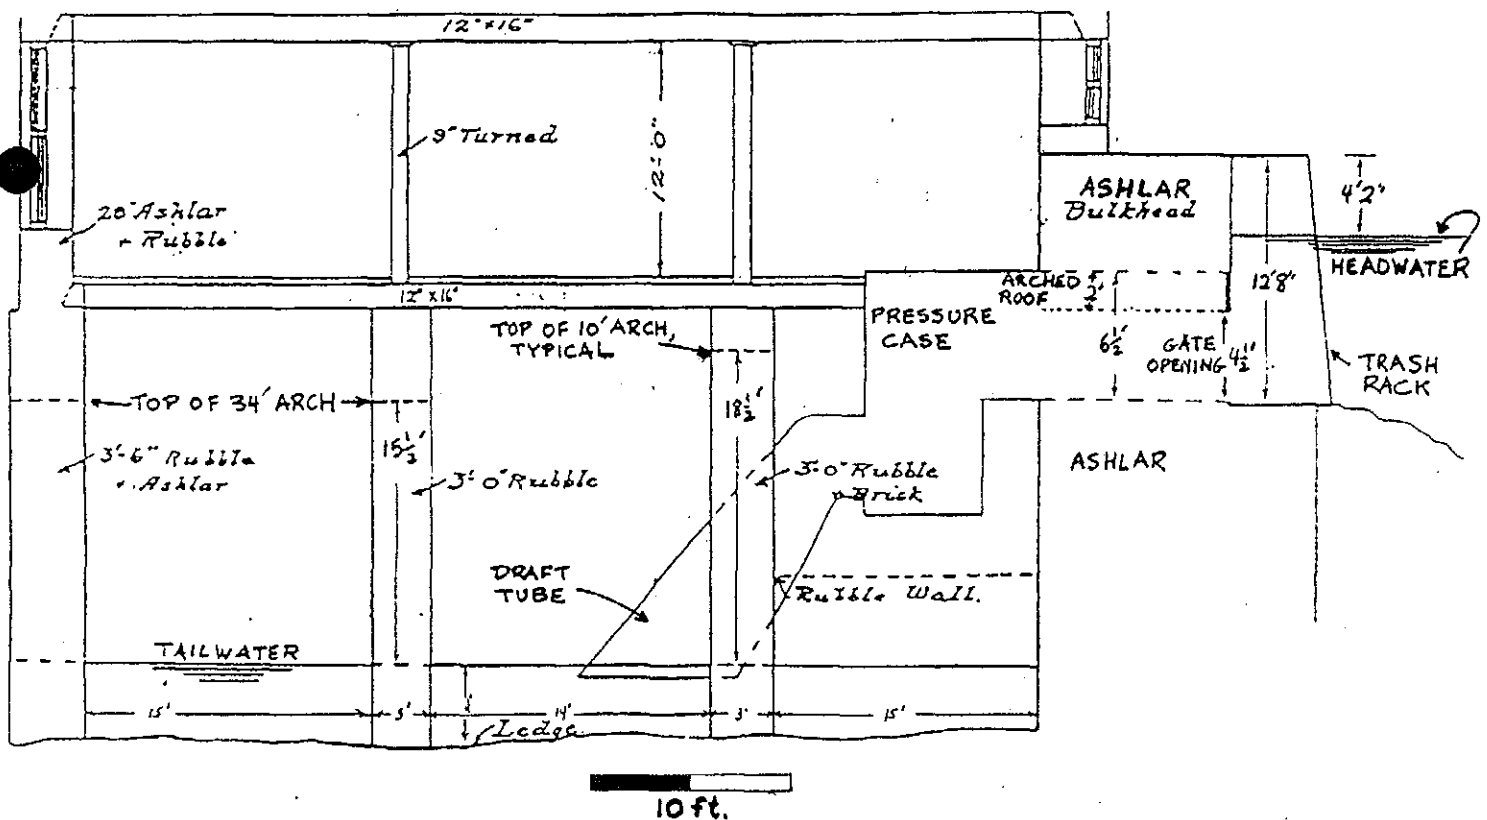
EAST-WEST SECTION THROUGH WHEELHOUSE
